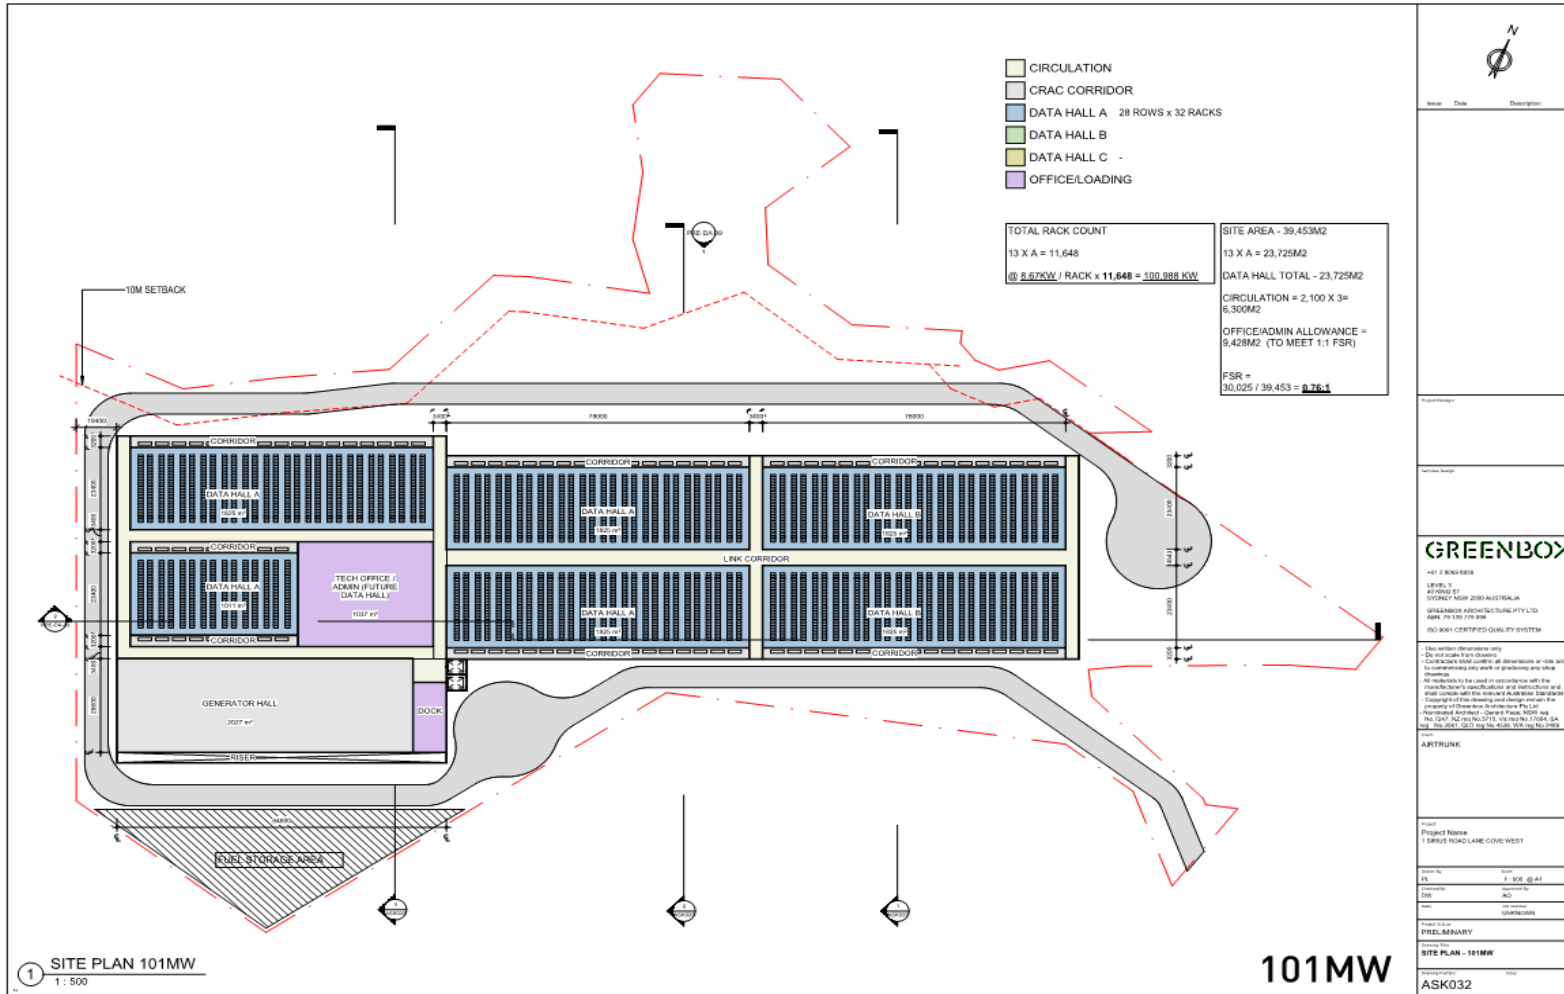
Proposed Preliminary Site Plan (Greenbox, 2018)
